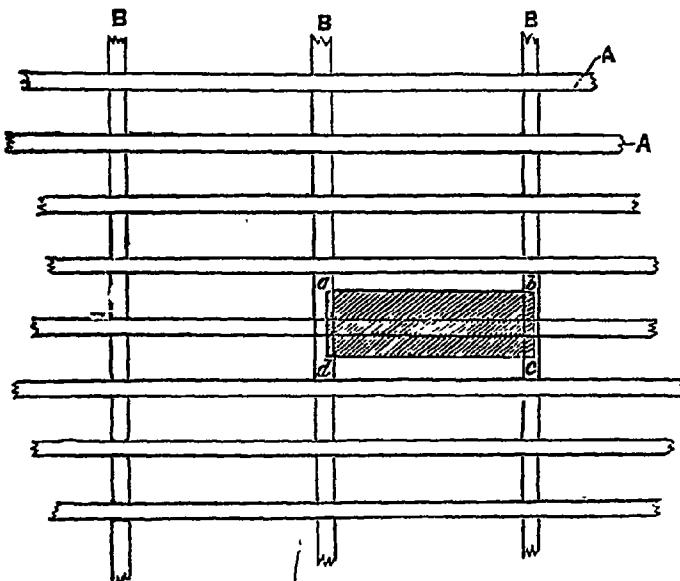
shows the area of roof supported by a batten on a pent roof. The shaded area a b c d is supported by one batten. A, A are the battens; B, B the common rafters. Scale 4 feet = 1 inch.
